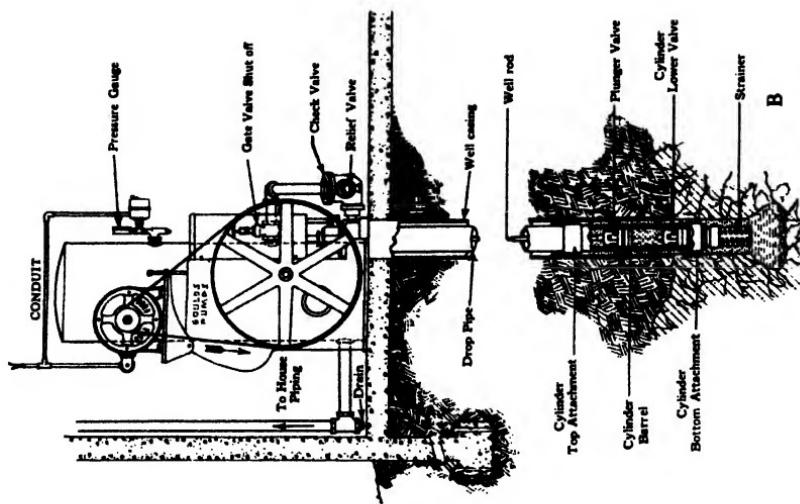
A and B courtesy Goulds Pumps, Inc.
